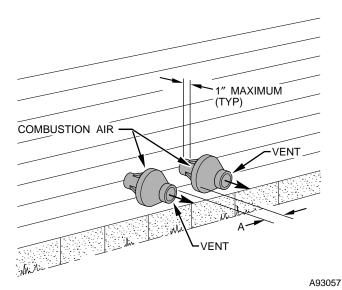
Concentric Vent and Combustion-Air Side Termination (Dimension "A" is Touching or 2-In. Maximum Separation)
